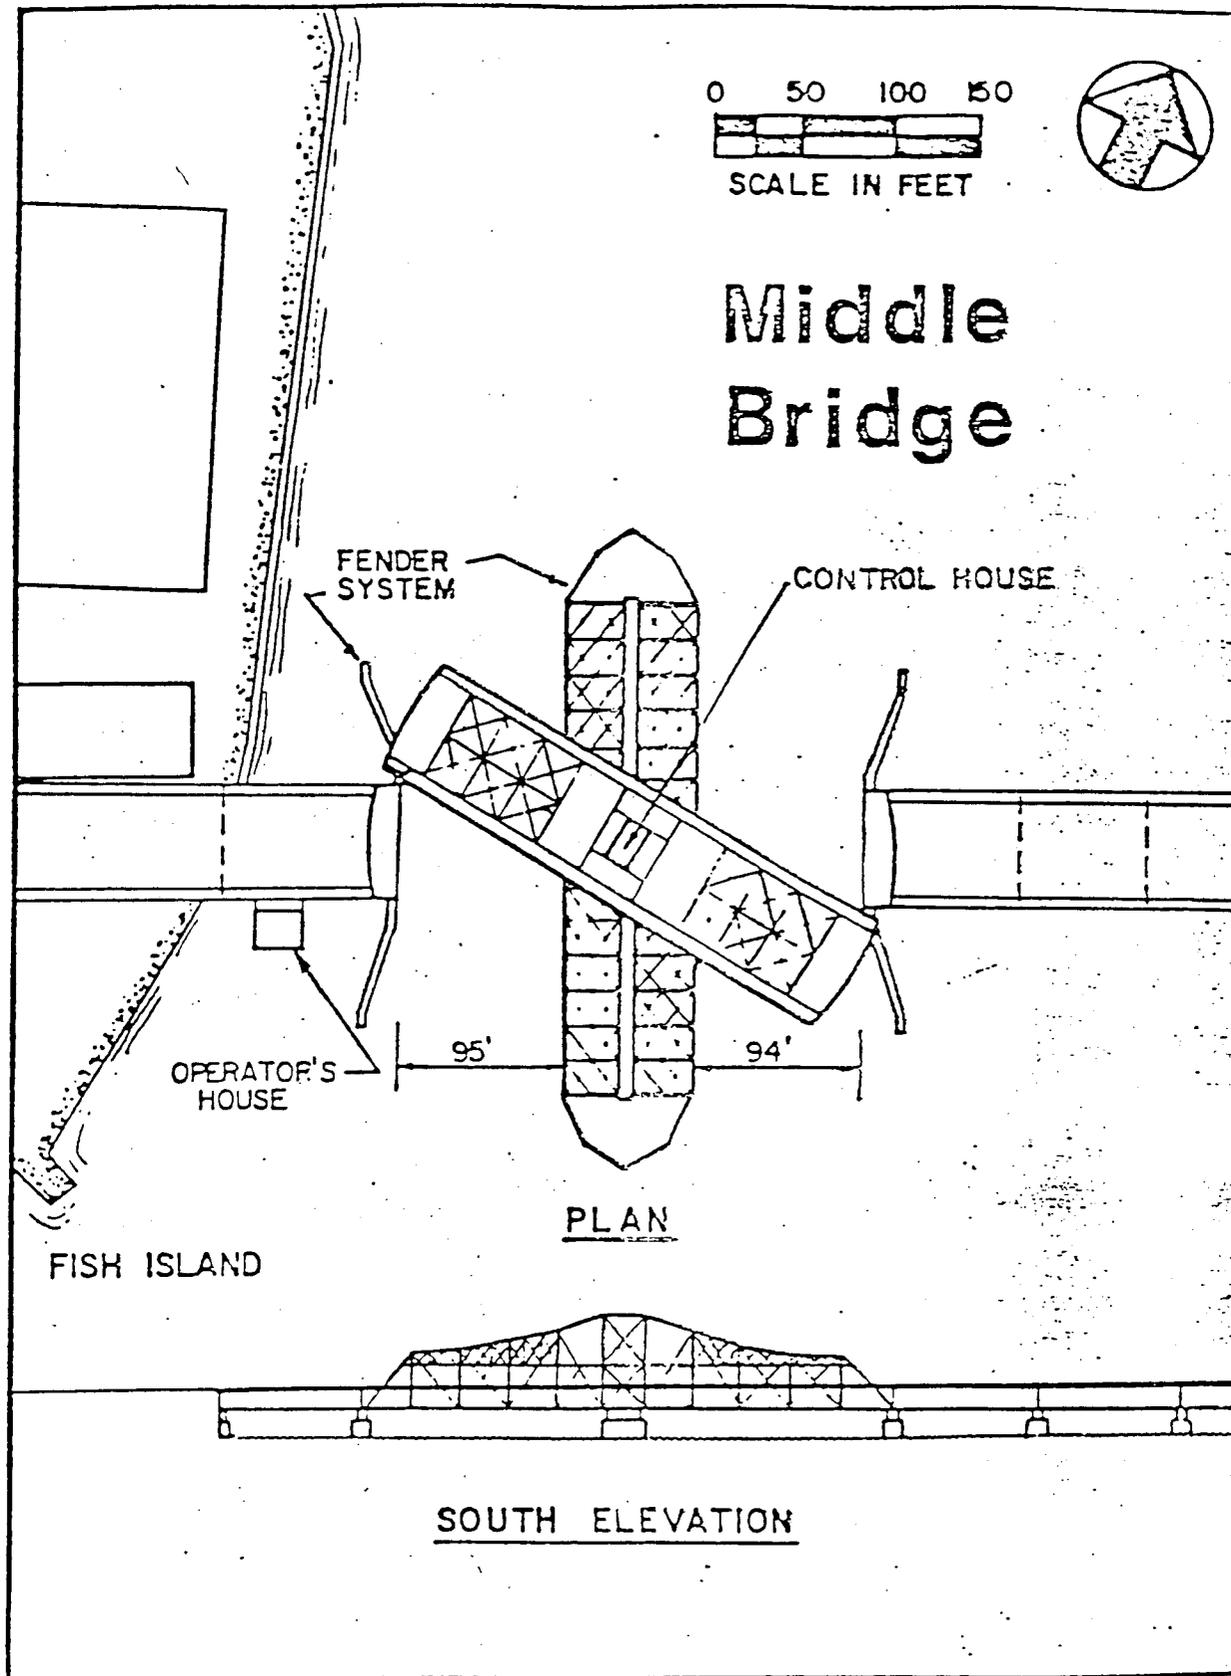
Plan of New Bedford-Fairhaven Middle Bridge.
